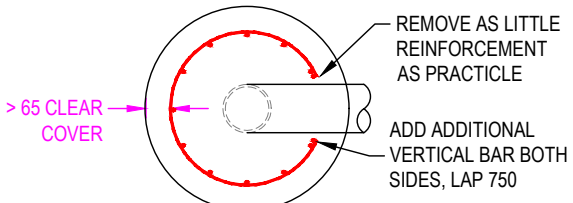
D: BASE PILE (PLAN SECTION D)
